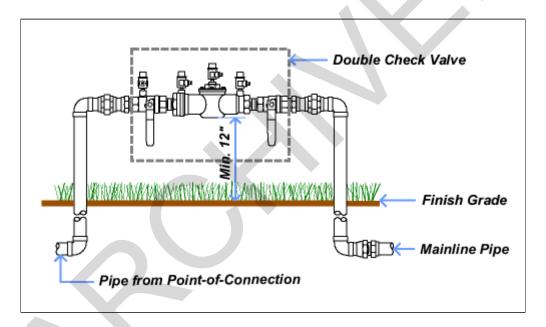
Double Check Valve Assembly Backflow Preventor
